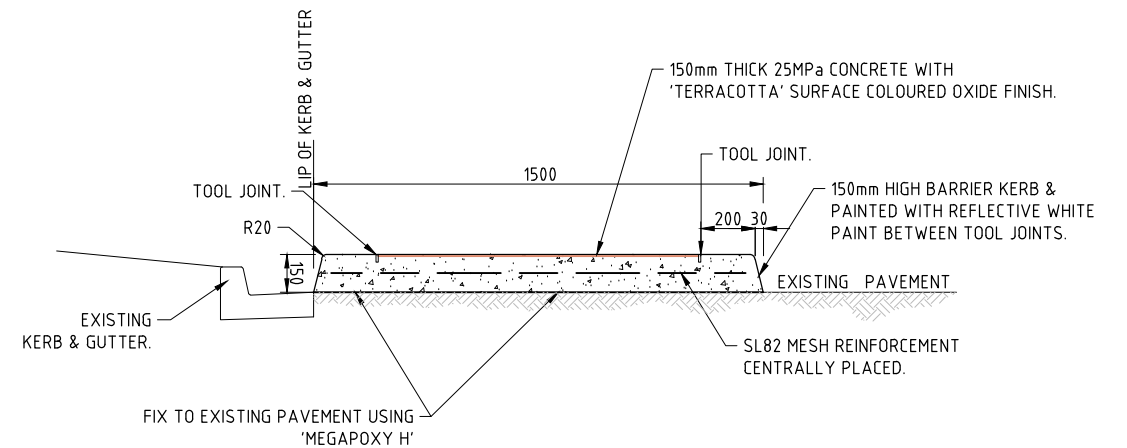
DETAILED PLAN OF RAISED BLISTER ISLAND
